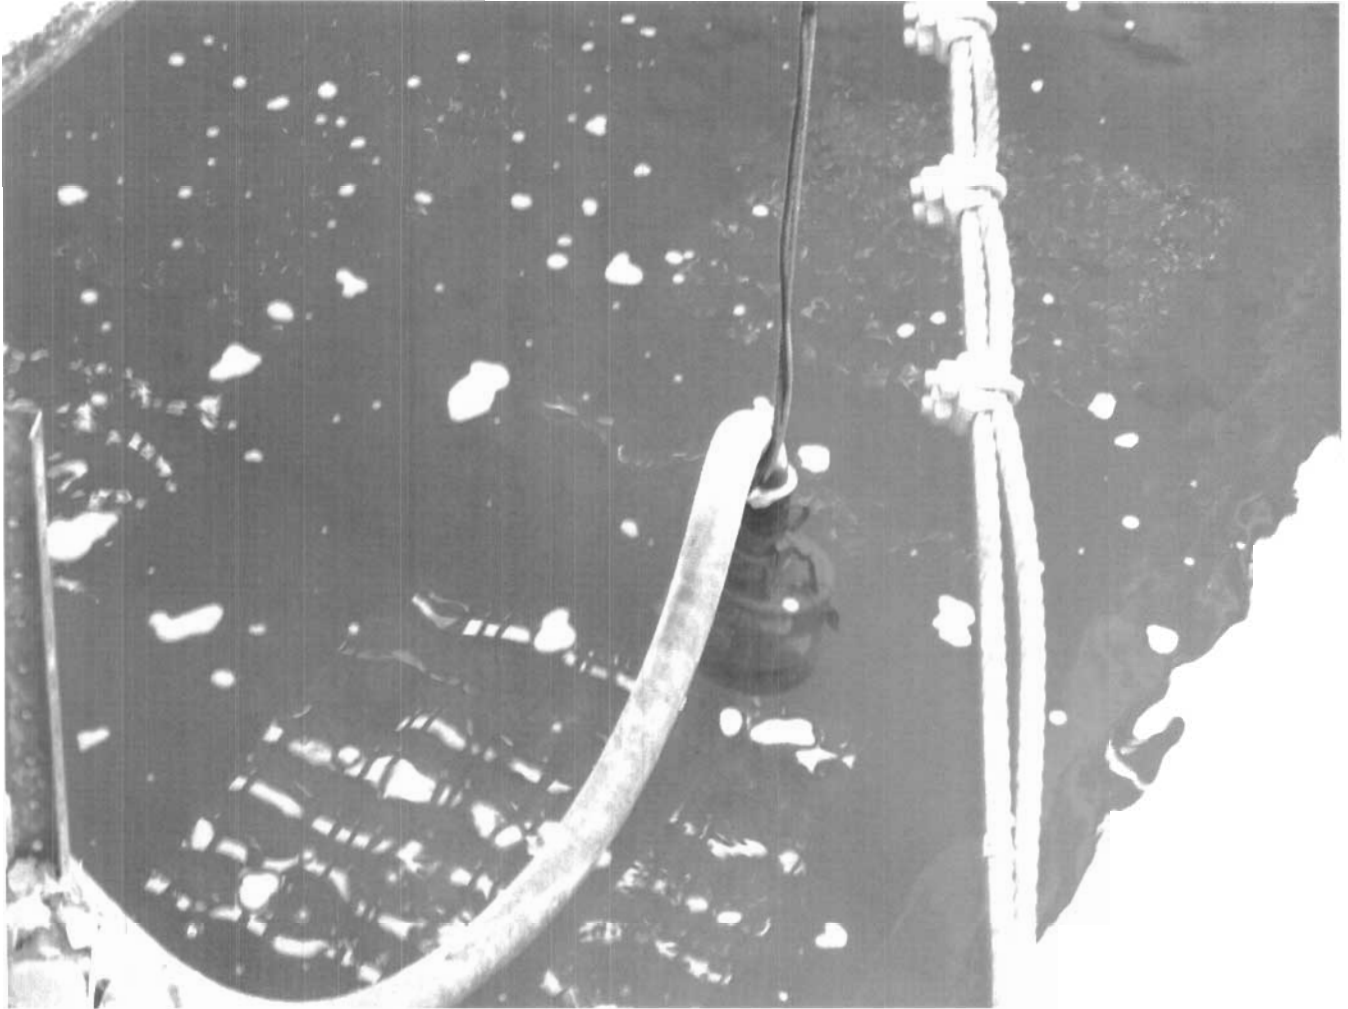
PHOTO B - FRESH WATER INTAKE AT STATION CREEK BRIDGE
